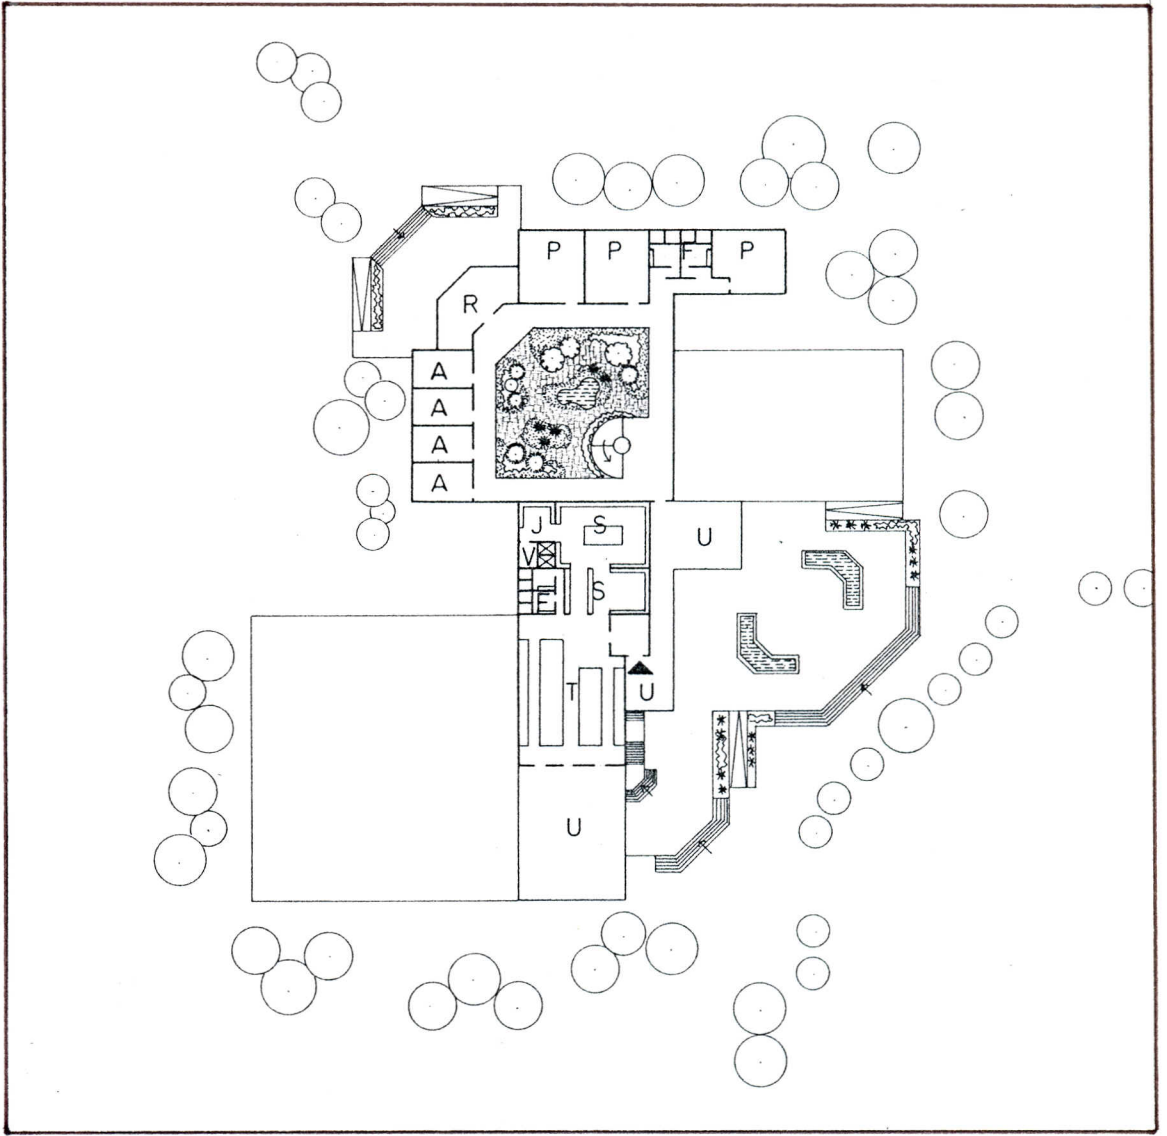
The Second Floor Plan of Manisa Community Centre
